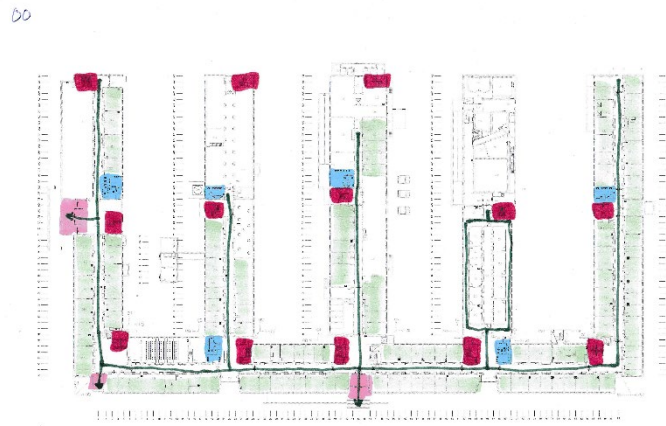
First floor (Red: Stairwells, Blue: Toilets, Green: Repetitive office structure)
